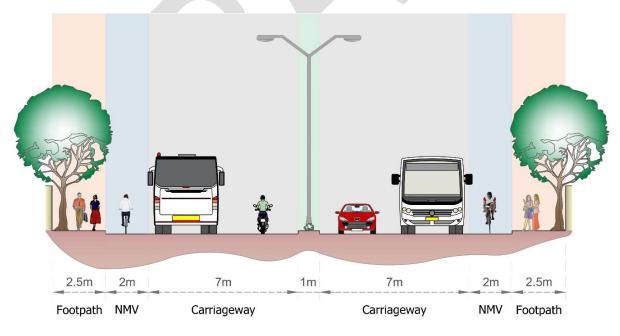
Typical Cross Section of 24m Wide Road with Bicycle Tracks
